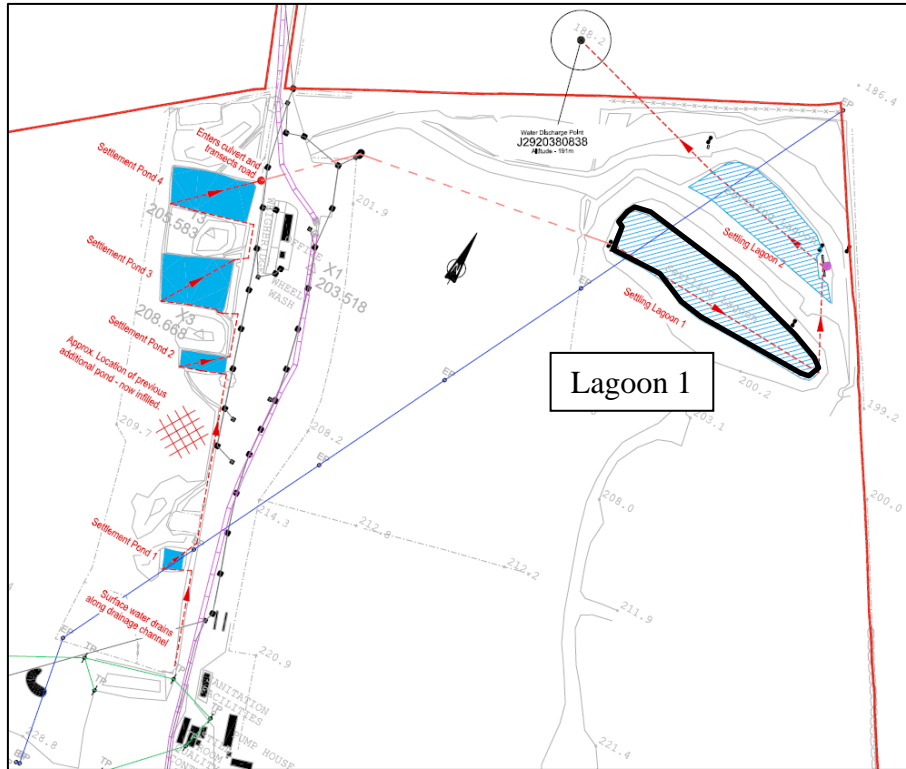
Existing Settlement Ponds and Lagoons layout sketch
